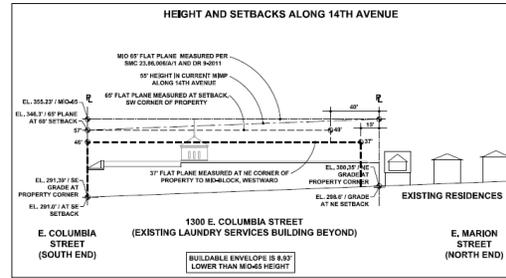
Height and Setbacks along 14<sup>th</sup> Avenue for the 1313 East Columbia Site
